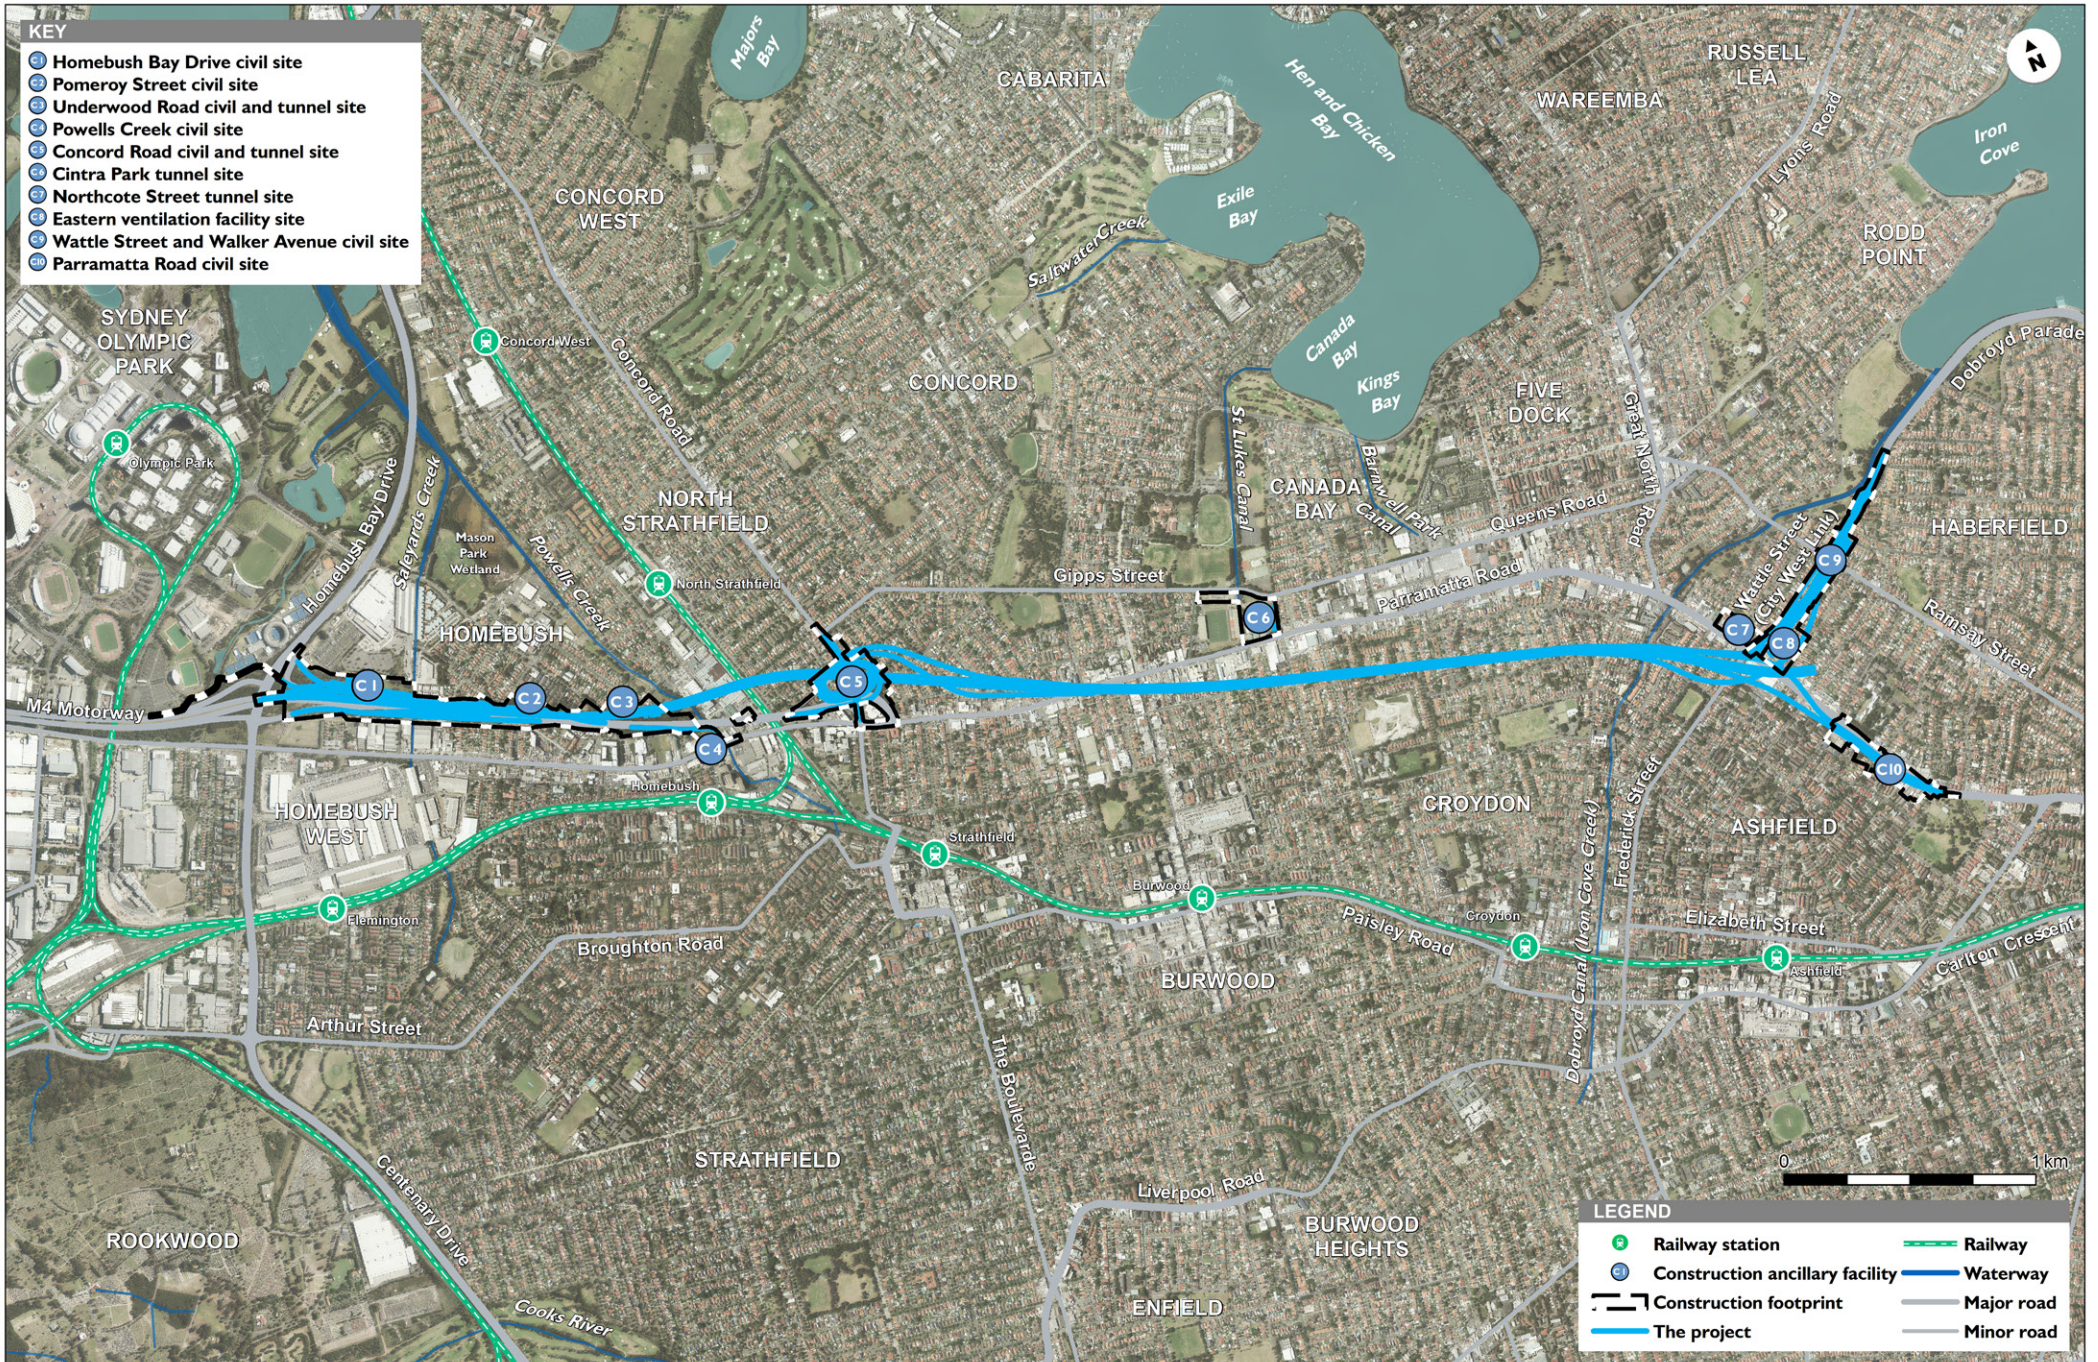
Overview of construction footprint and construction ancillary facilities
